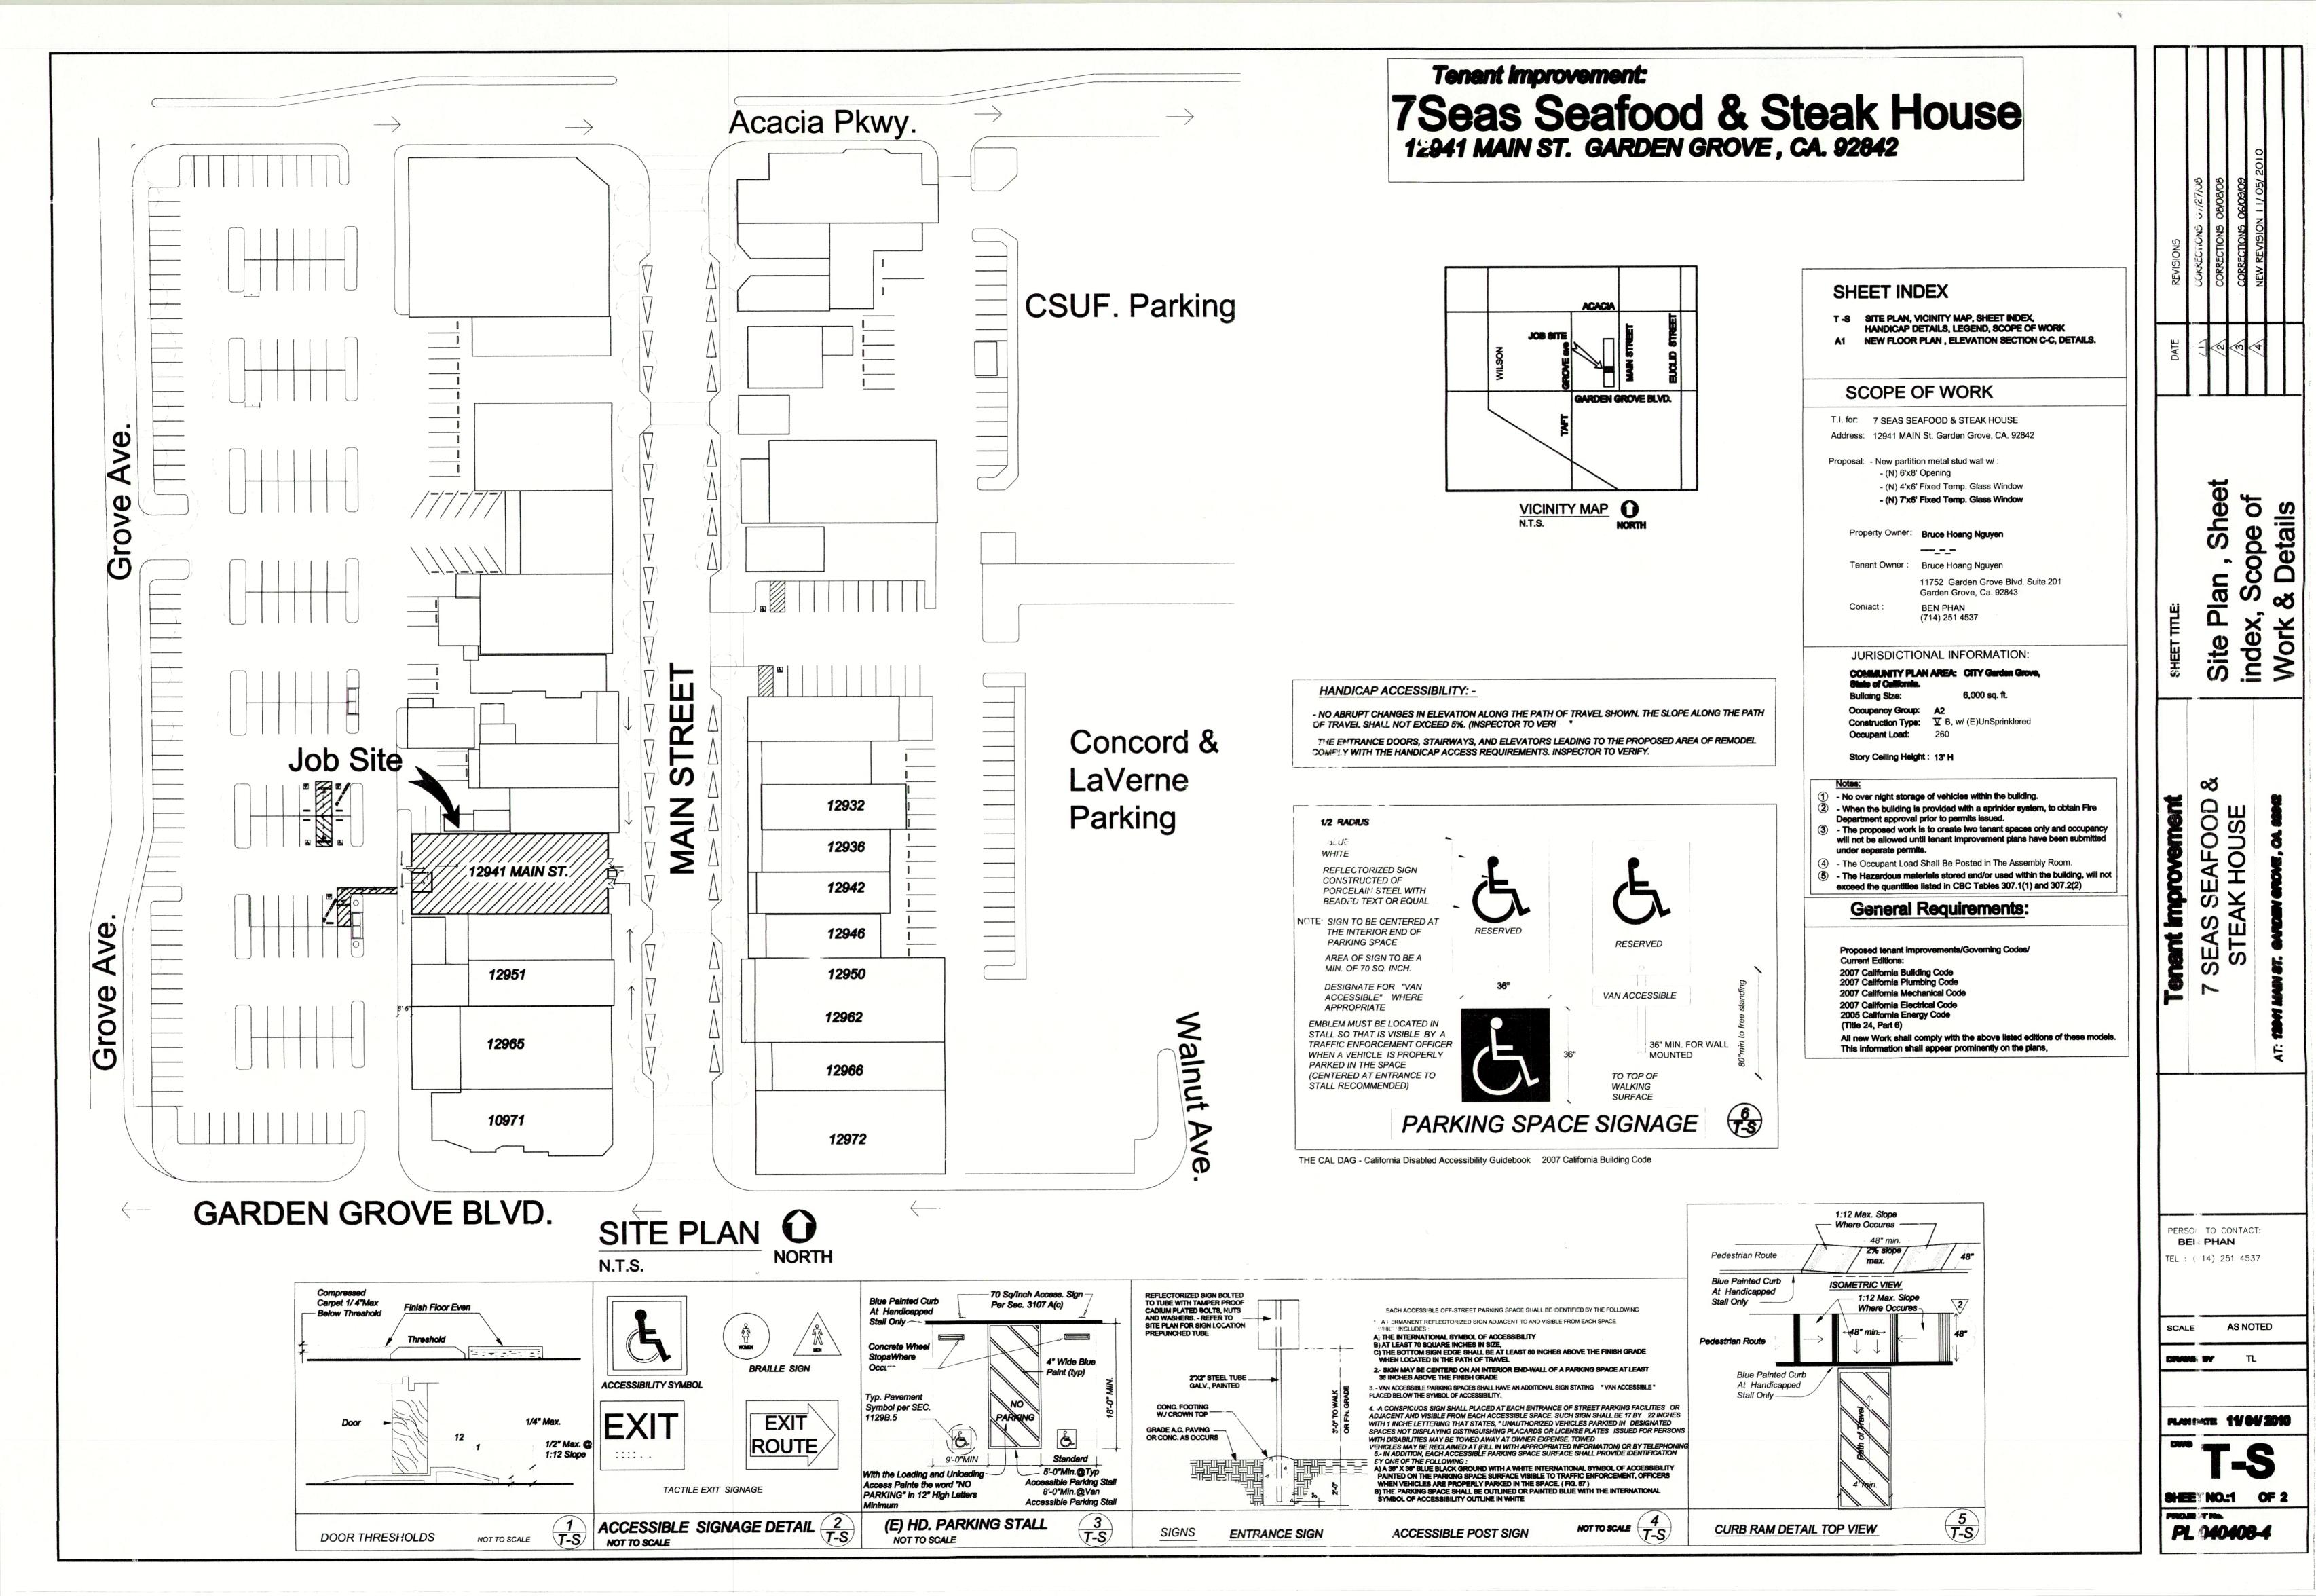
EXHIBIT "A" Conditional Use Permit No. CUP-284-09 (REV. 1023)
